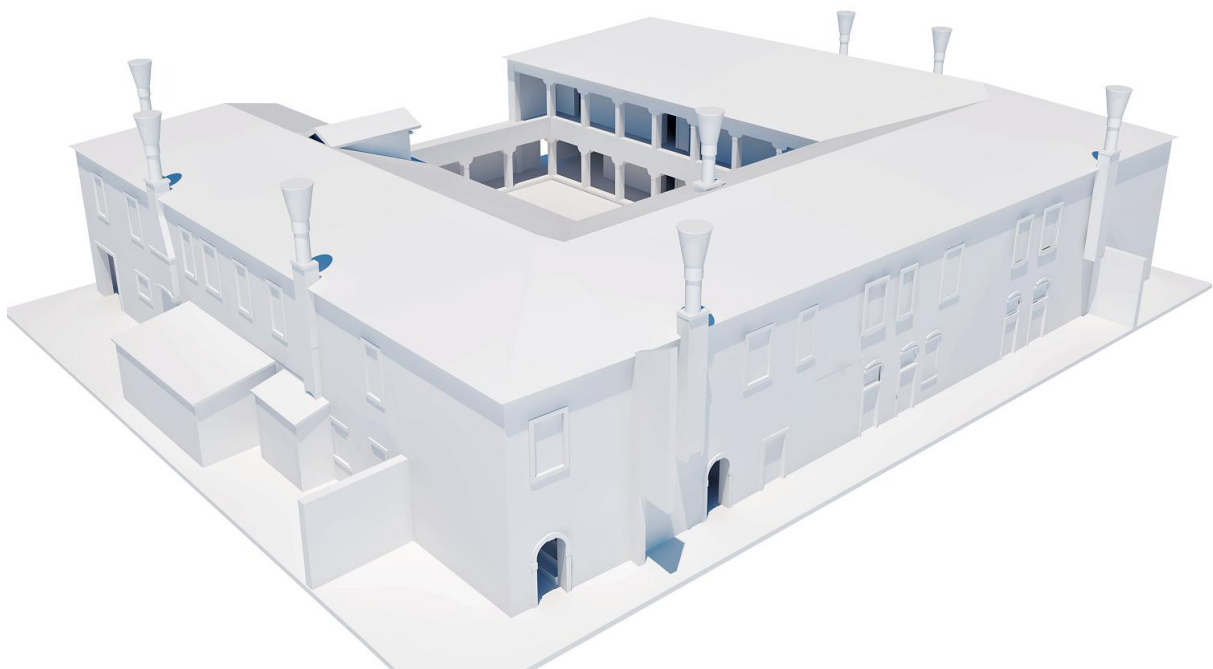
Digital reconstruction of the Generalato, views of west and south façades.
